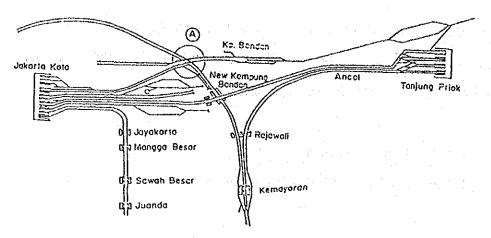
Sketch Drawing at Kampung Bandan
